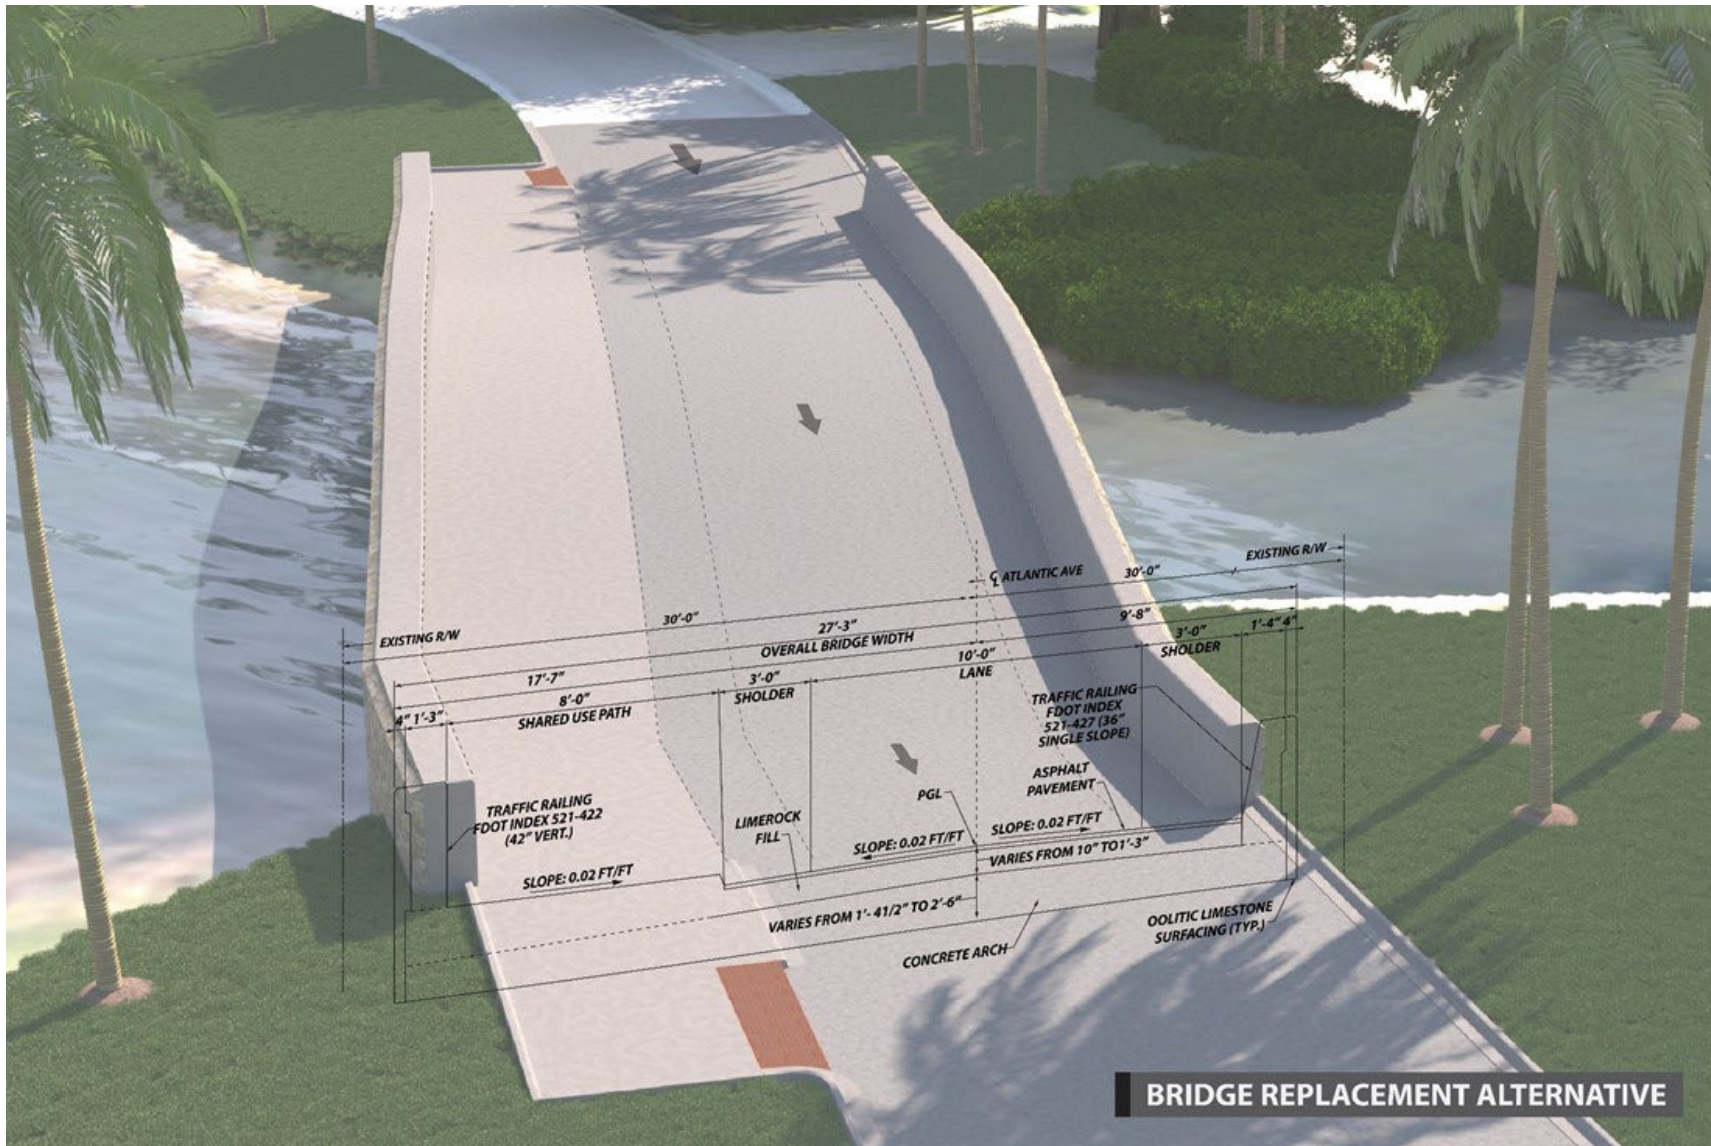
Build Alternative 2 – Replacement, Proposed Typical Section
